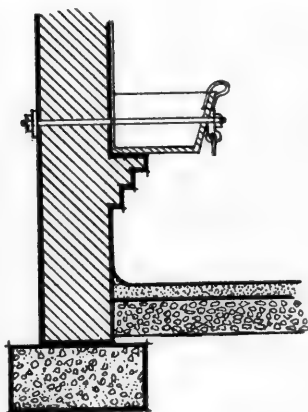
Section showing a substantial type of wood manger with corbelling and tie bolt.
